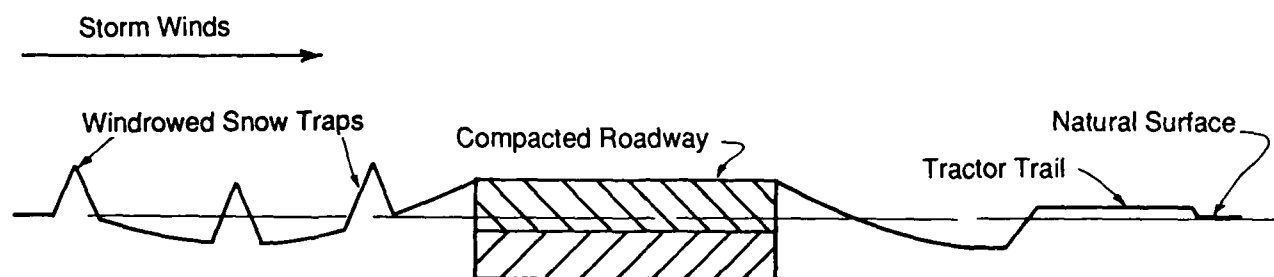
Typical cross section of a two-layer elevated snow road (NCEL).
